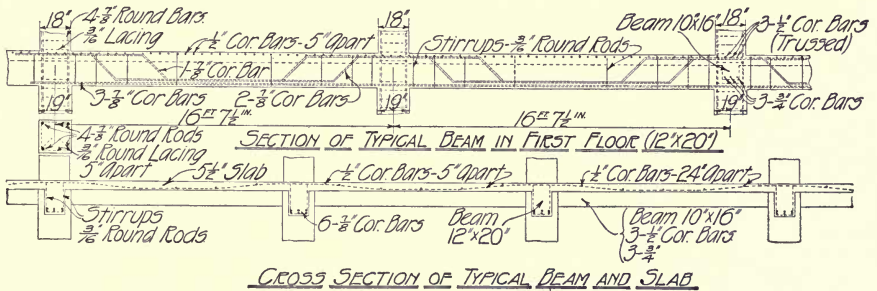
Details of Reinforcement of Typical Beam and Slab. (See p. 104.)
